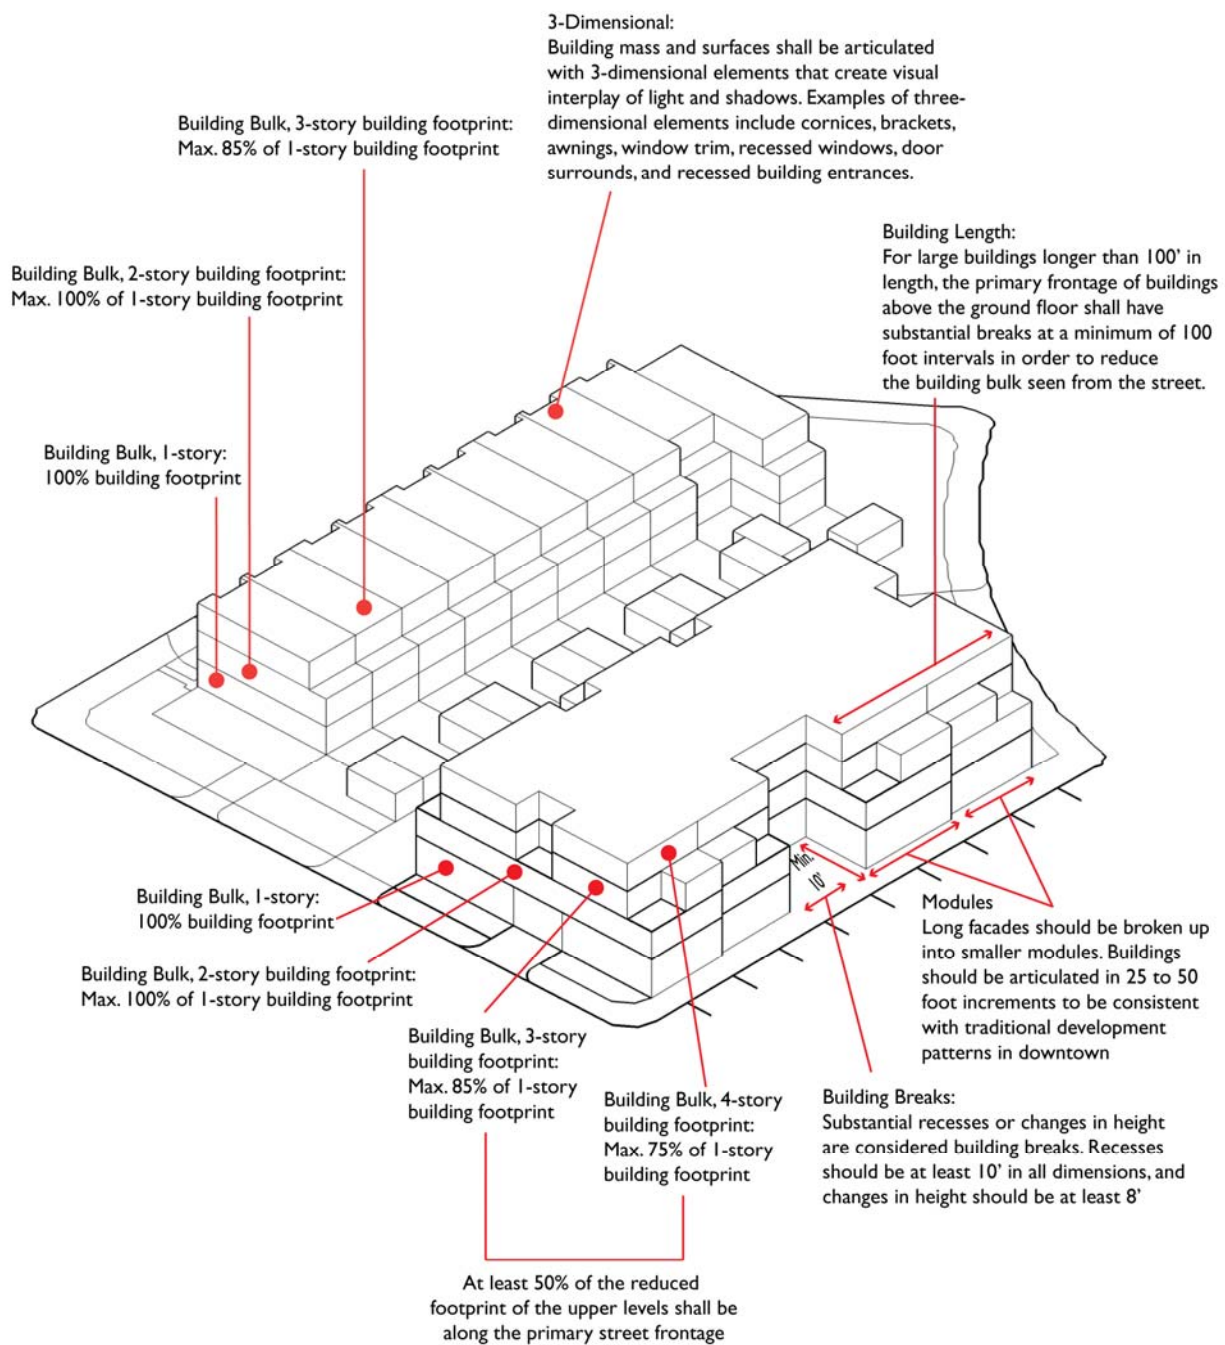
V-2 Building Bulk, Articulation, and Length (Small Site)
